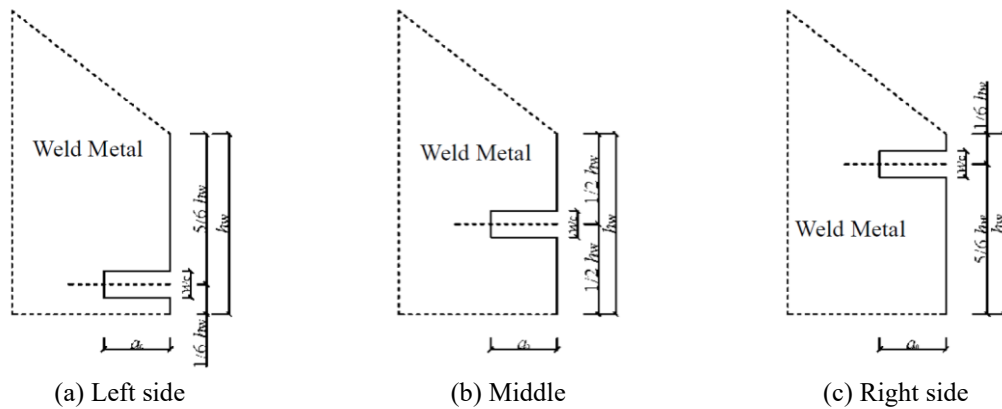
Schematic diagram of initial defect positions in the weld area of the lower flange (Notes: a_0 =depth of the initial defect; w_c =width of the initial defect; h_w =height of the weld external side)
